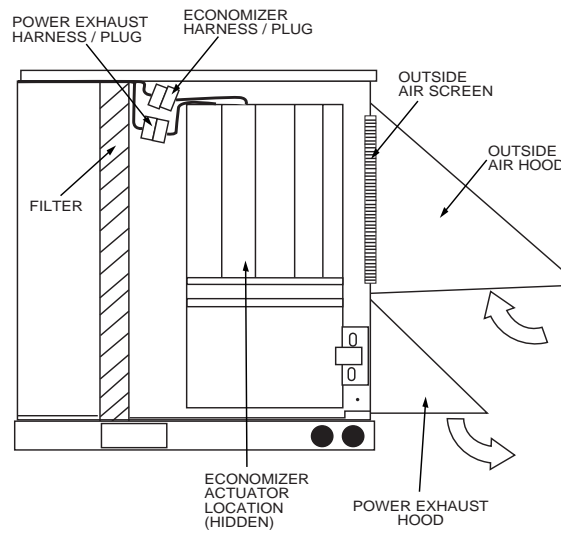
Side View of Horizontal Economizer and Power Exhaust
